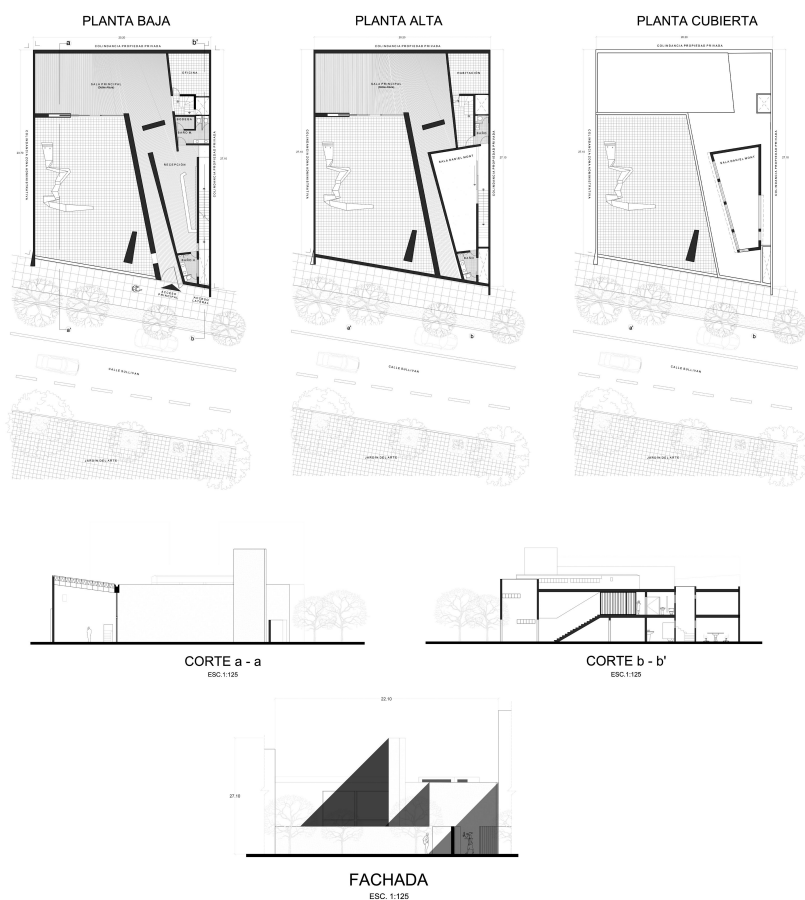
Floor plans, cross-sections, and facade of El Eco.
